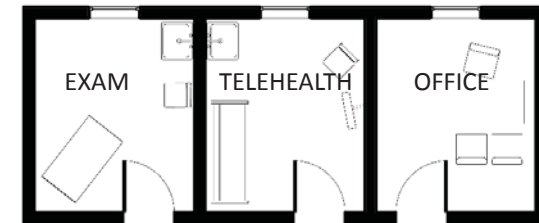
Adaptable Rooms at Ely-Bloomenson CAH (Source: DSGW Architects, Diagrammed by Staloch)
